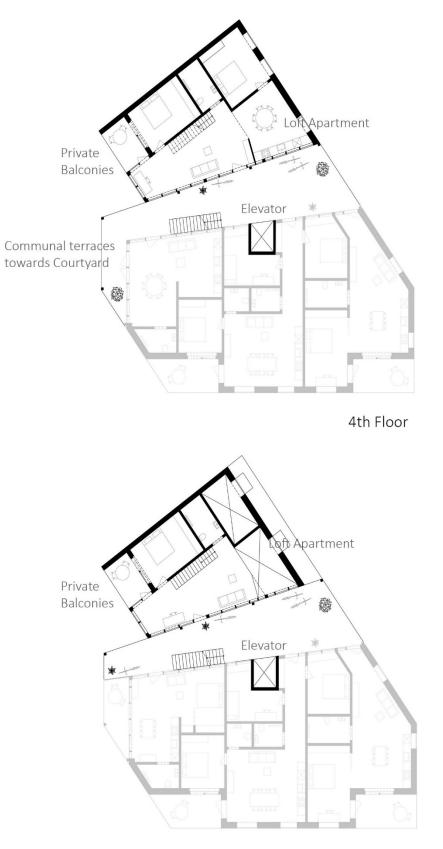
Floorplans of addition at Tagensvej (2/2), Scale 1:250 (A4)
